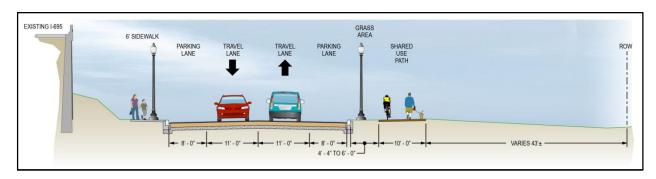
B Proposed Typical Section between 4^{th} and $5^{th}/6^{th}$ Streets
